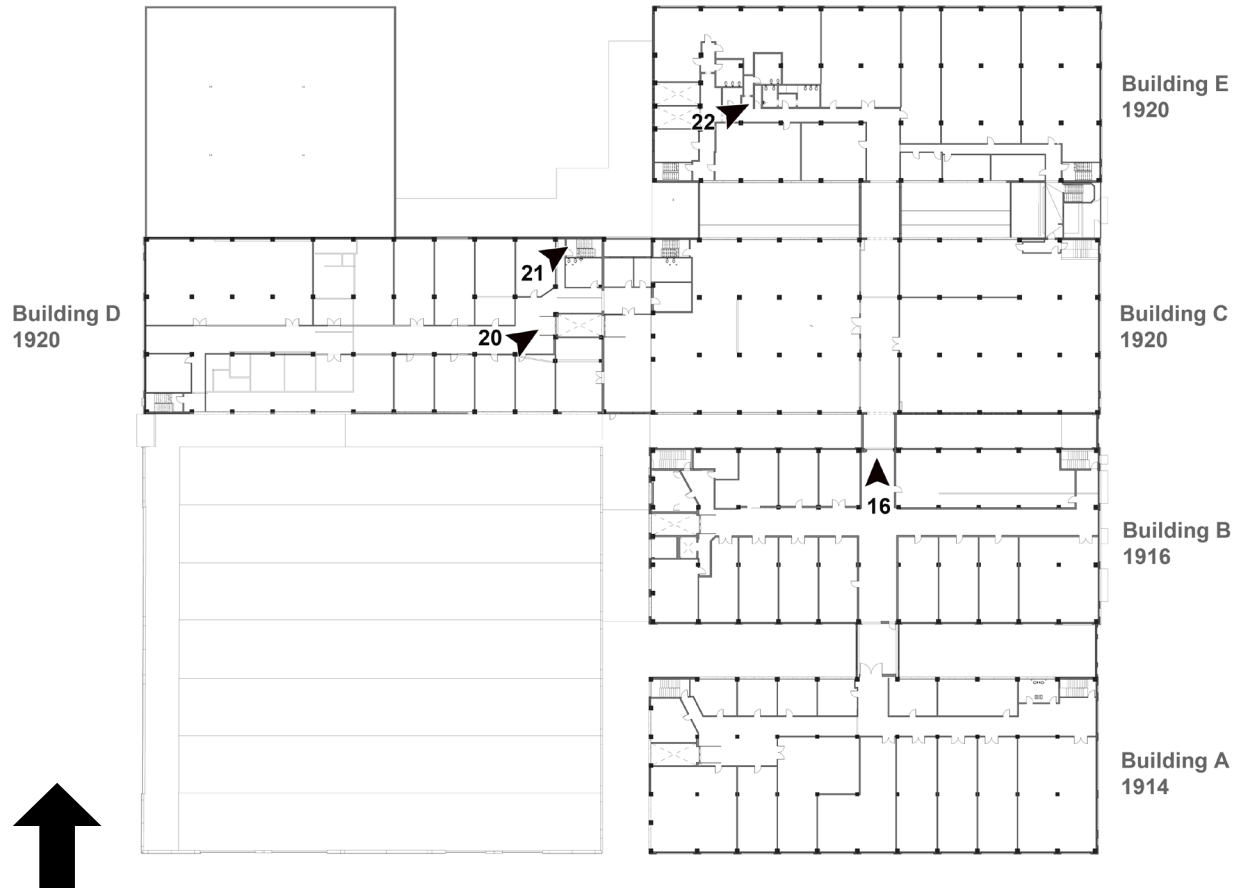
Exterior and first floor photo key and current floor plan. Not to scale. Base plan from Delv Architecture.
